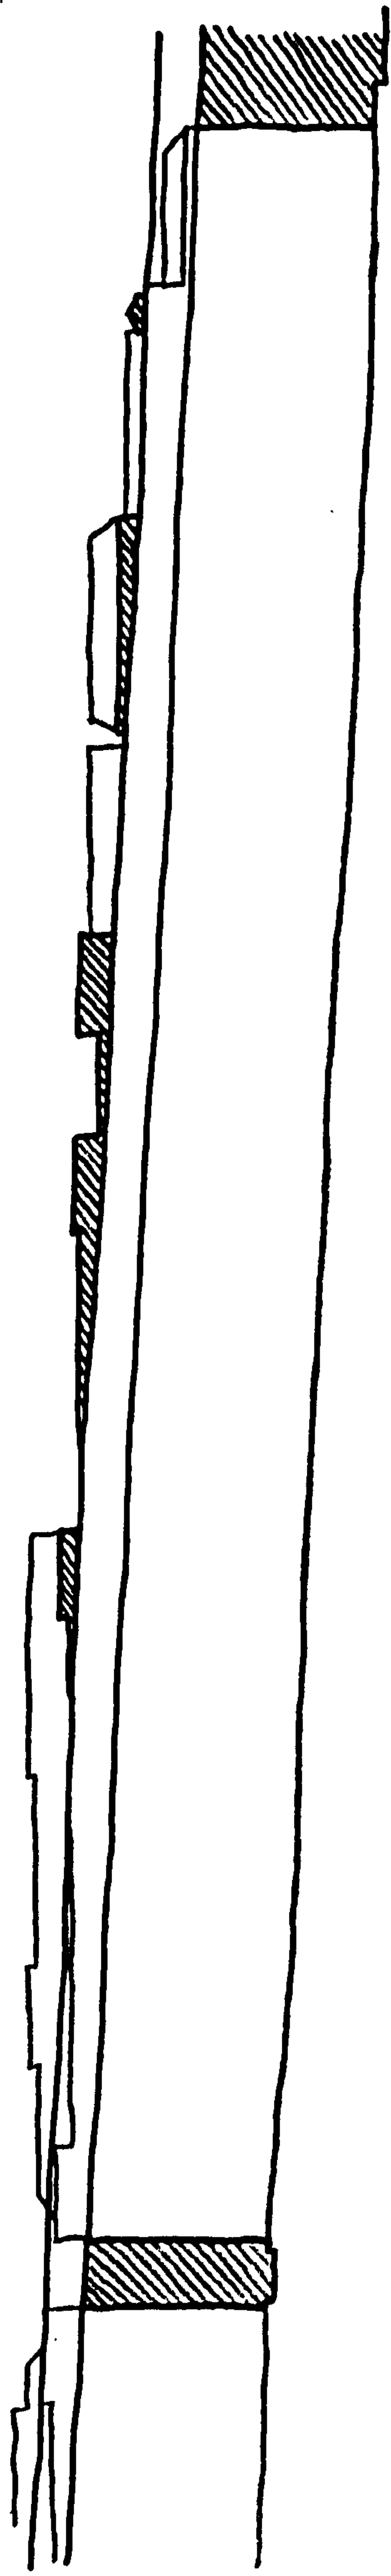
ELEVATIONS : JOHN DOBSON STREET . WEST SIDE
